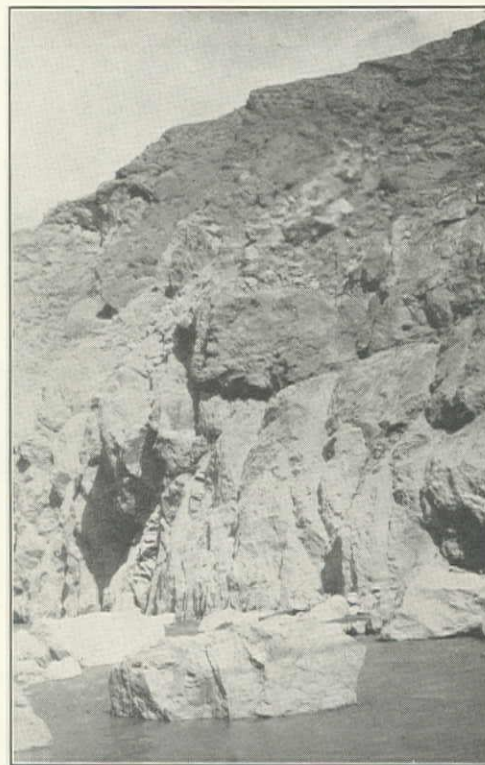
South Abutment of Littlefield Dam, Looking Upstream
